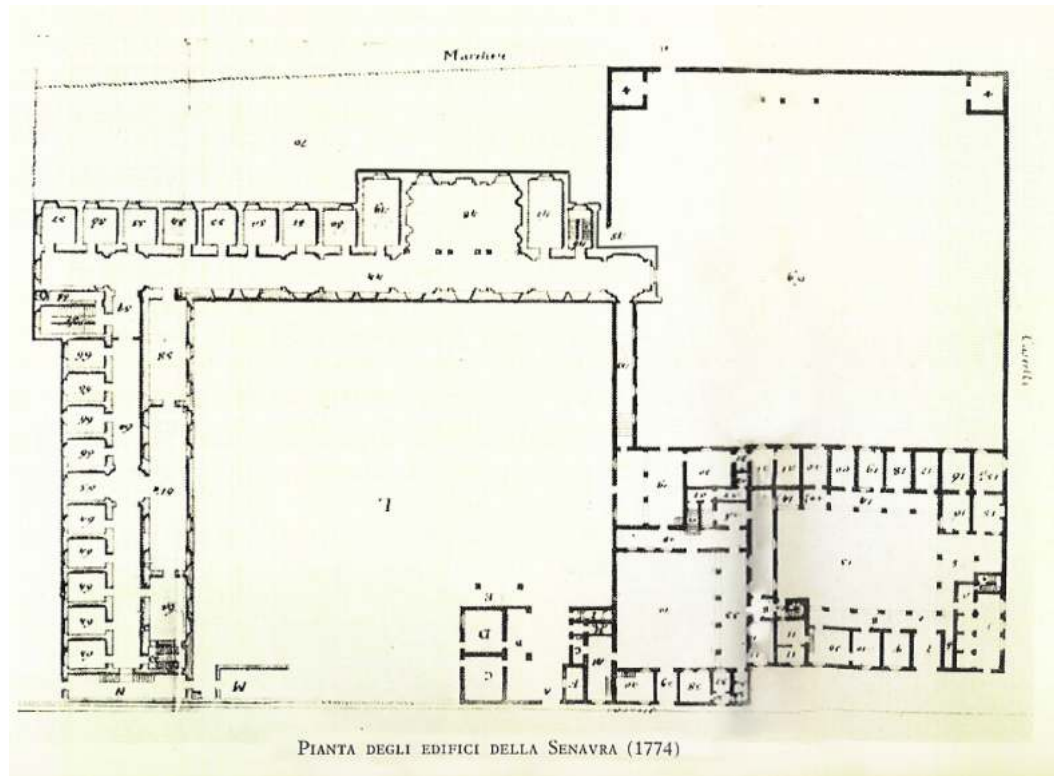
Floor plan of the Senavra complex, 1774 (ASM). This plan shows the layout of the former Jesuit college of Senavra, which was repurposed in 1773 to house Milan's new psychiatric hospital. The structure, organized around large courtyards and symmetrical wings, reflects the adaptation of convent architecture to the requirements of modern medicine: individual cells, segregated wards, service areas, and controlled circulation paths. The reuse of Senavra stands as a paradigmatic case of the transformation of the religious claustrum into a space of confinement and care, in line with the hygienic and disciplinary principles of Josephine reform
